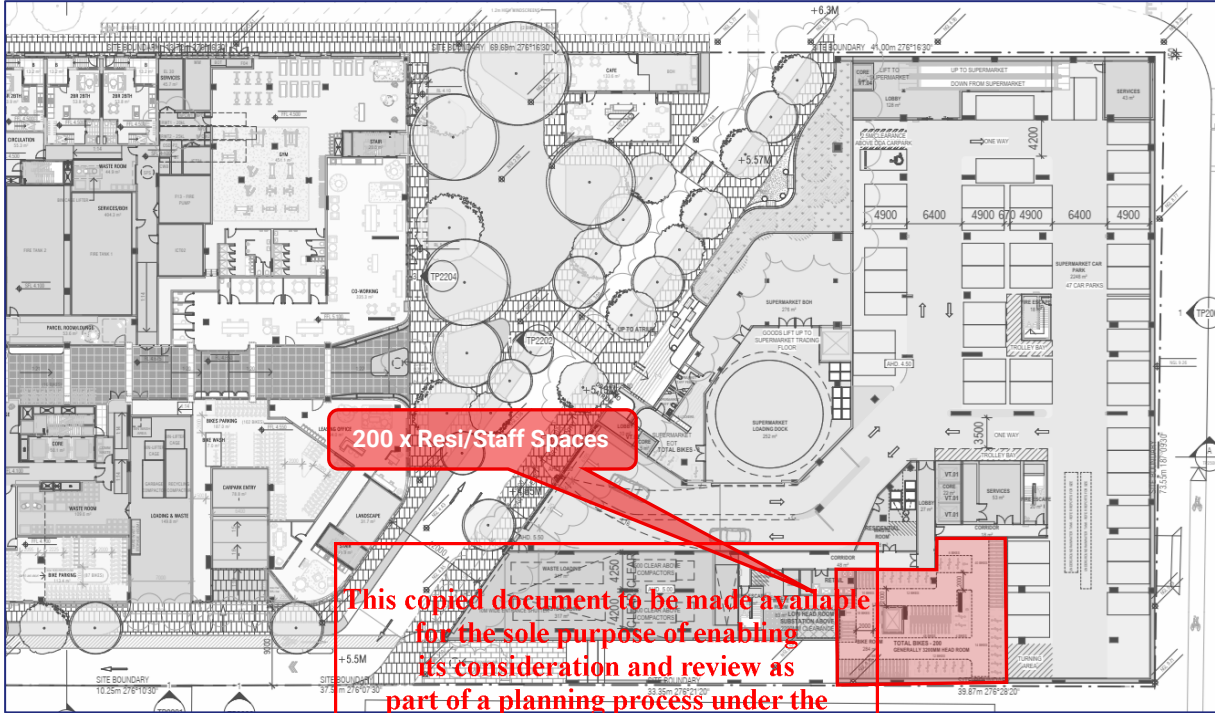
Bicycle Parking – Stage 1 Lower Ground Floor
